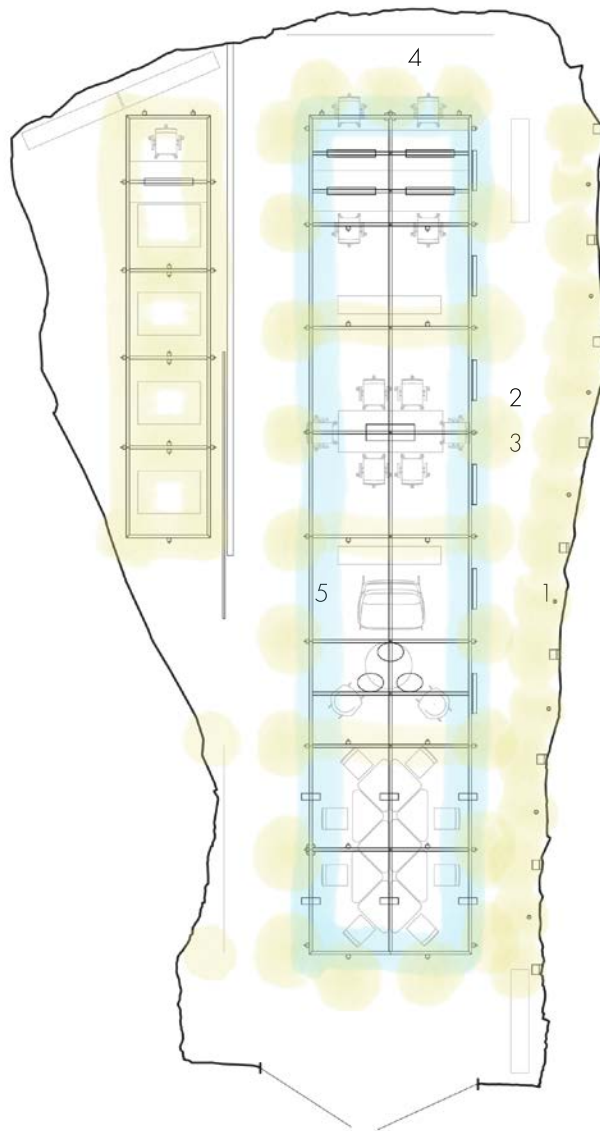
Sketch of lighting plan for scenario 4 in Lab 2
